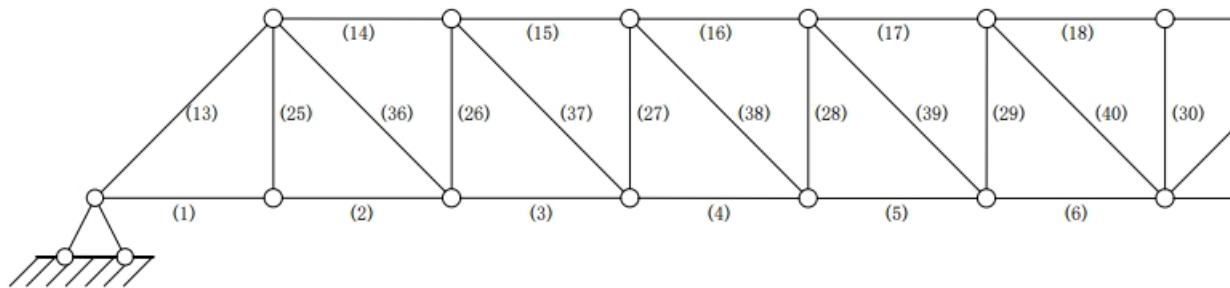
Part of the Pratt Truss Bridge Scheme 2 model
